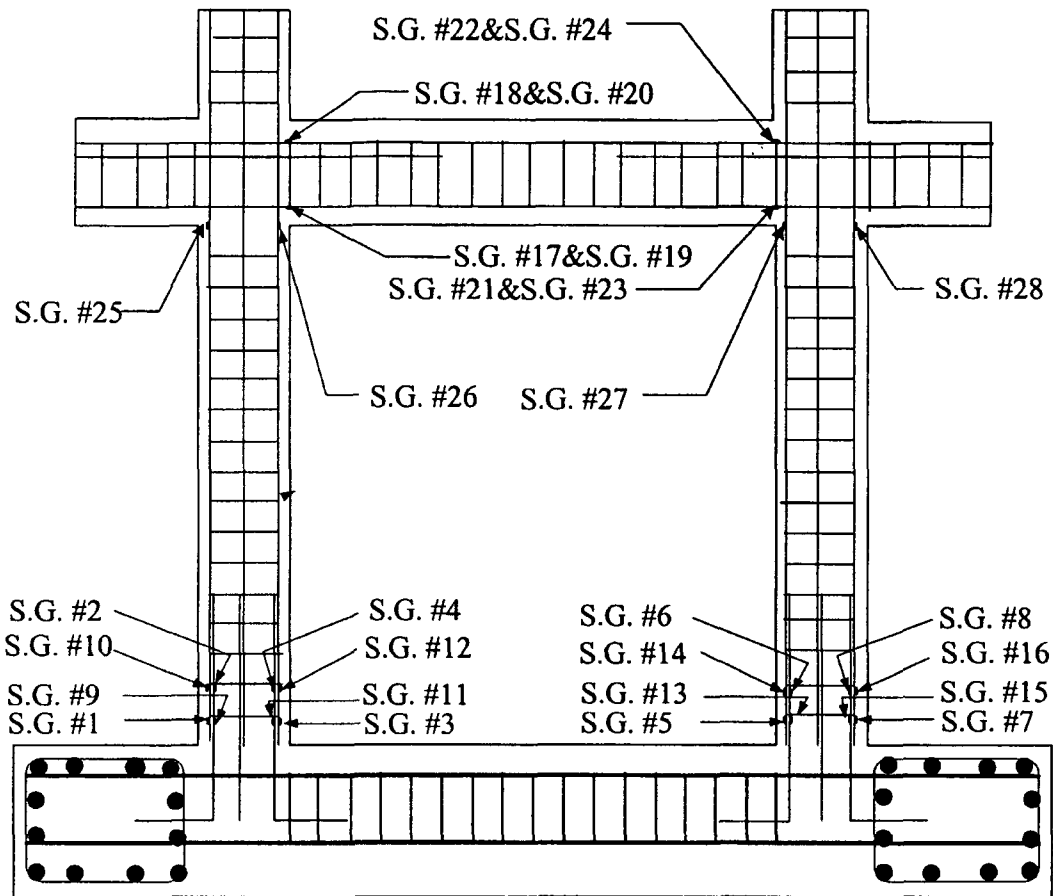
Typical reinforcement layout and strain gauge placement (Shalouf, 2005)
